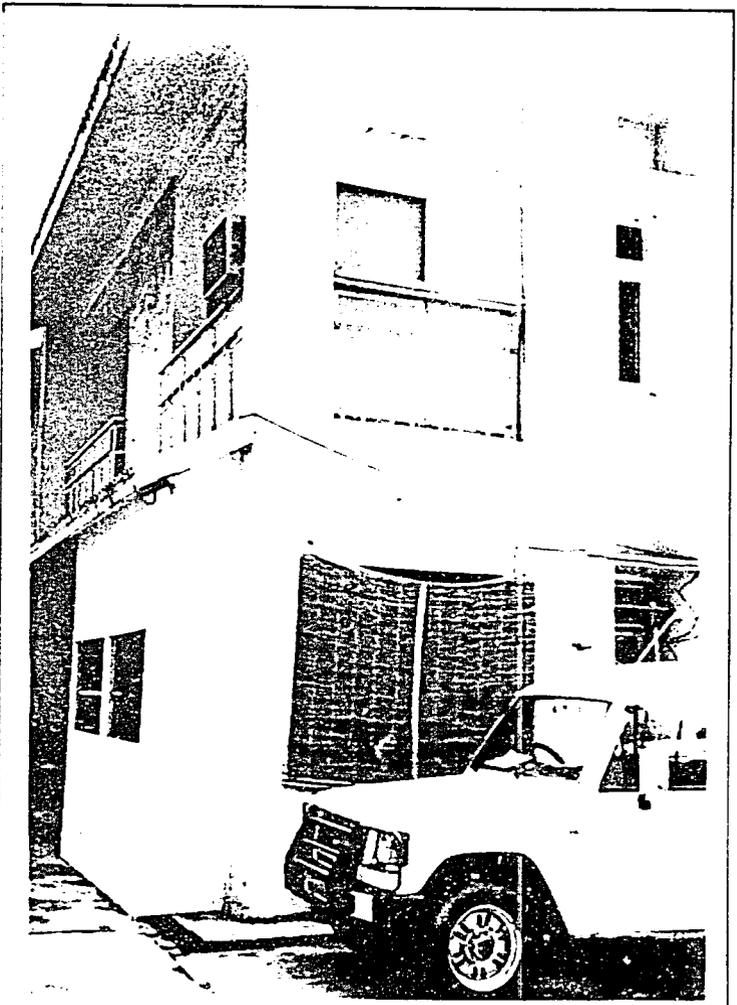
Peshawar MSH Office Facility. Northwest corner of building.
